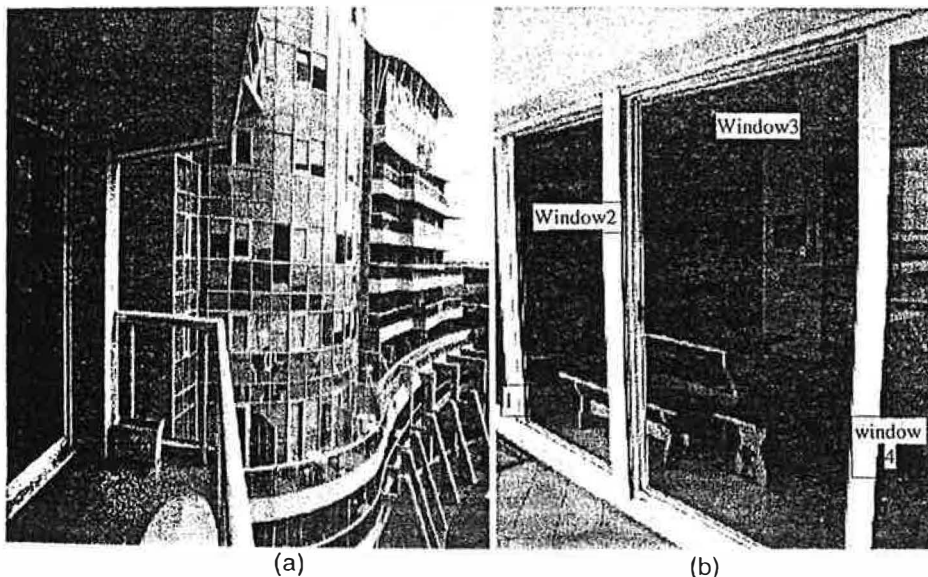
(a) The apartment(5<sup>th</sup> floor of the building) (b)The window pane
